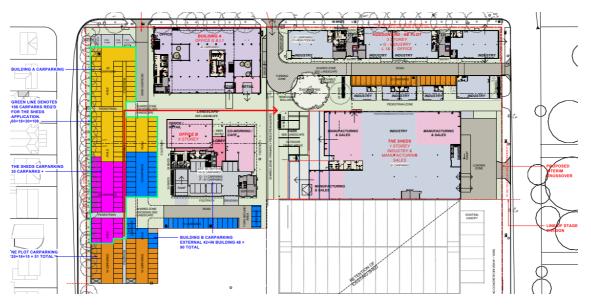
Plan of proposal, Source: Architectural Plan (TP400. Rev A) by Six Degrees Pty Ltd
